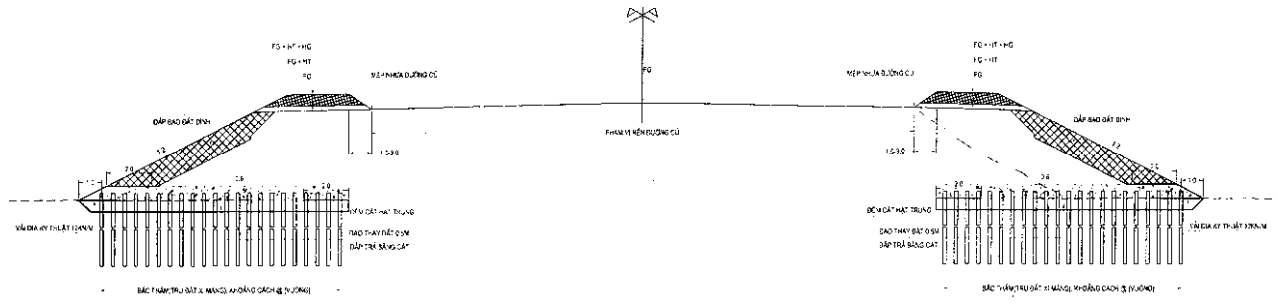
Layout of Prefabricated Vertical Drain (PVD)
